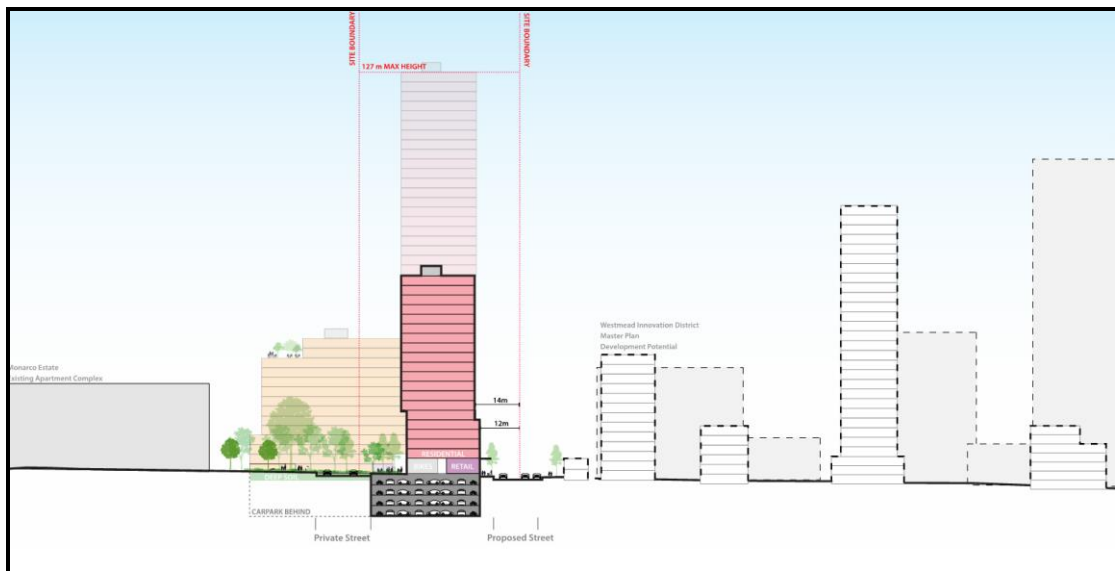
Section- Building Height, Setbacks and Separation (Looking South Toward Buildings 1A and 2) (Roberts Day 2019)
